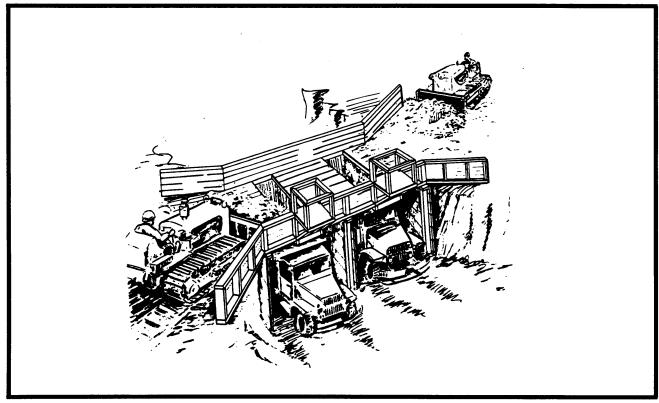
Double-End Trap, Overhead-With-Ramps Loading Ramp
